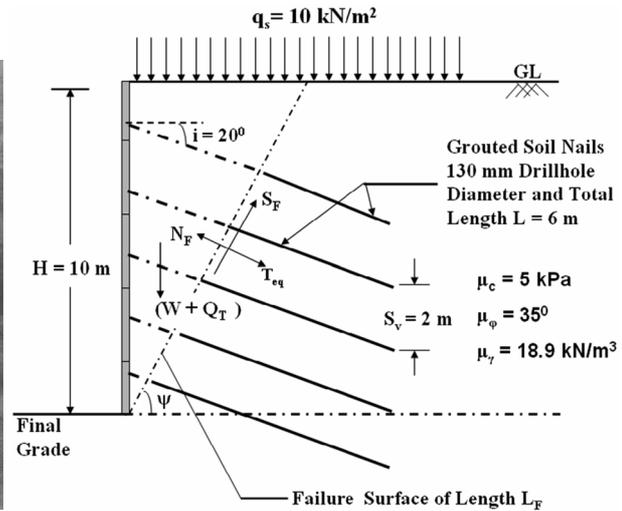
Schematic typical cross-section of the prototype soil nail wall
